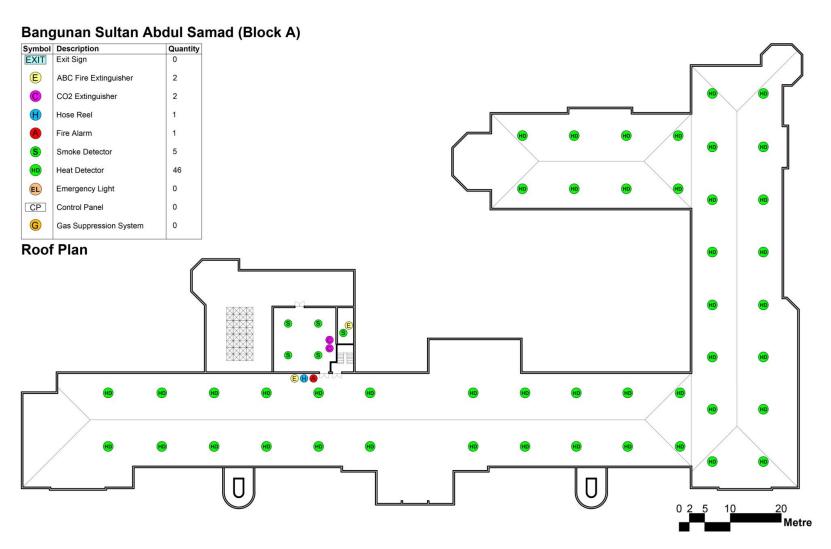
Location of active fire protection measures at Roof Level of Sultan Abdul Samad Building
